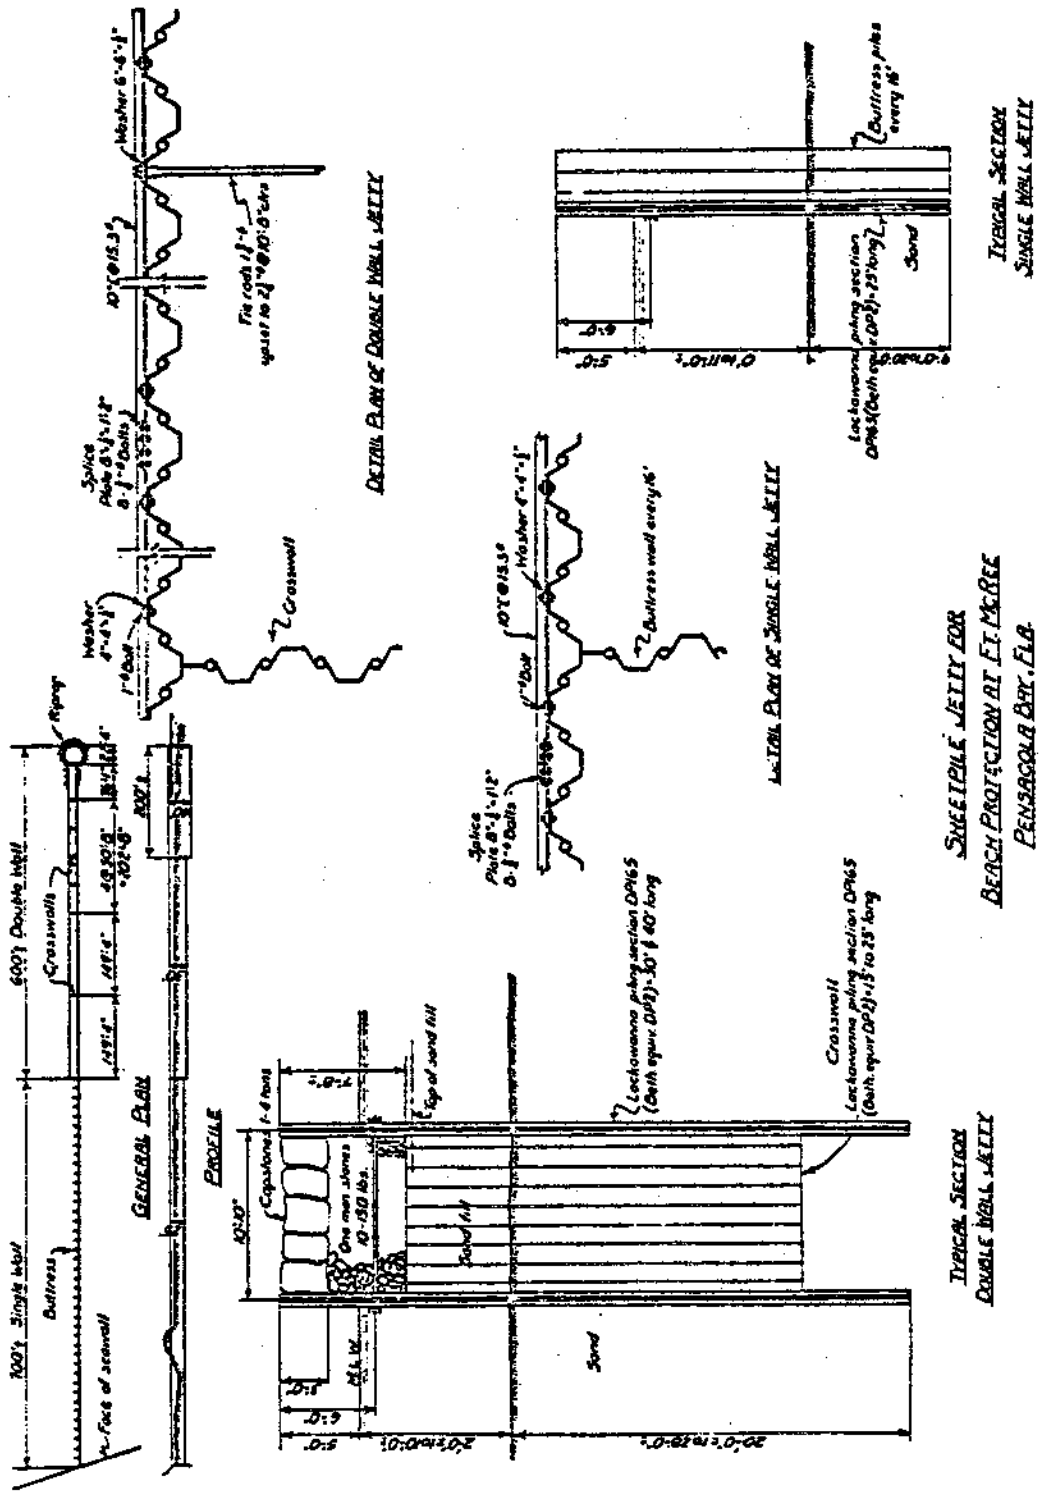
Butressed Single Wall and Double Wall Steel Sheet Pile Jetty (USCOE, 1963, p. 1. 31)
